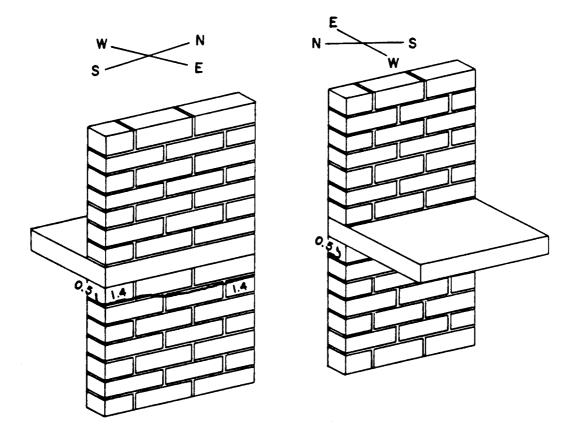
Crack Distribution at Failure on Specimen WSA400
